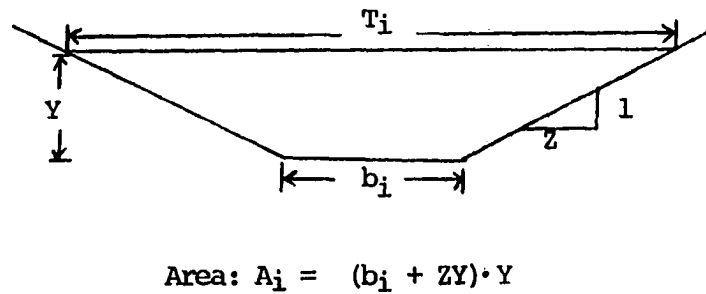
GEOMETRIC ELEMENTS OF CHANNEL SECTIONS
